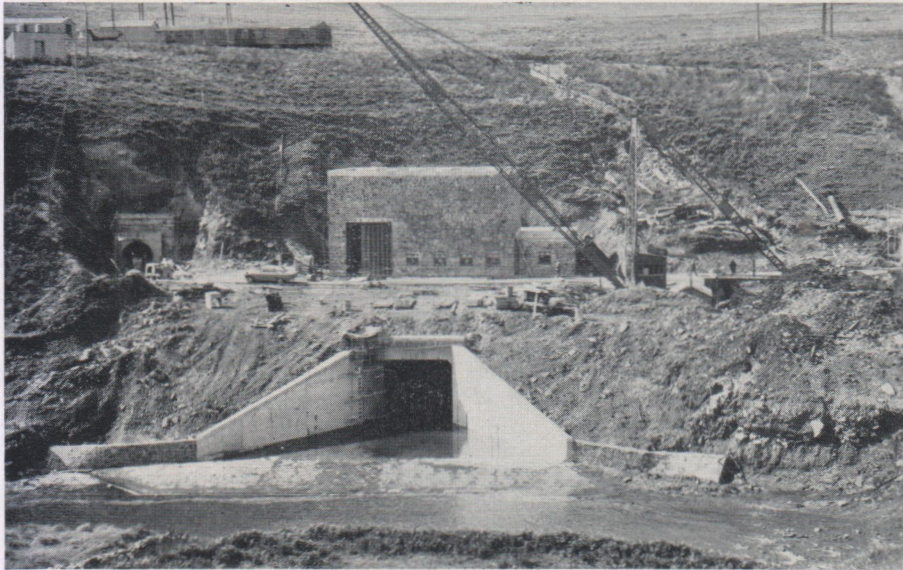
Dinas power station showing tunnel adit and unsubmerged tailrace culvert
